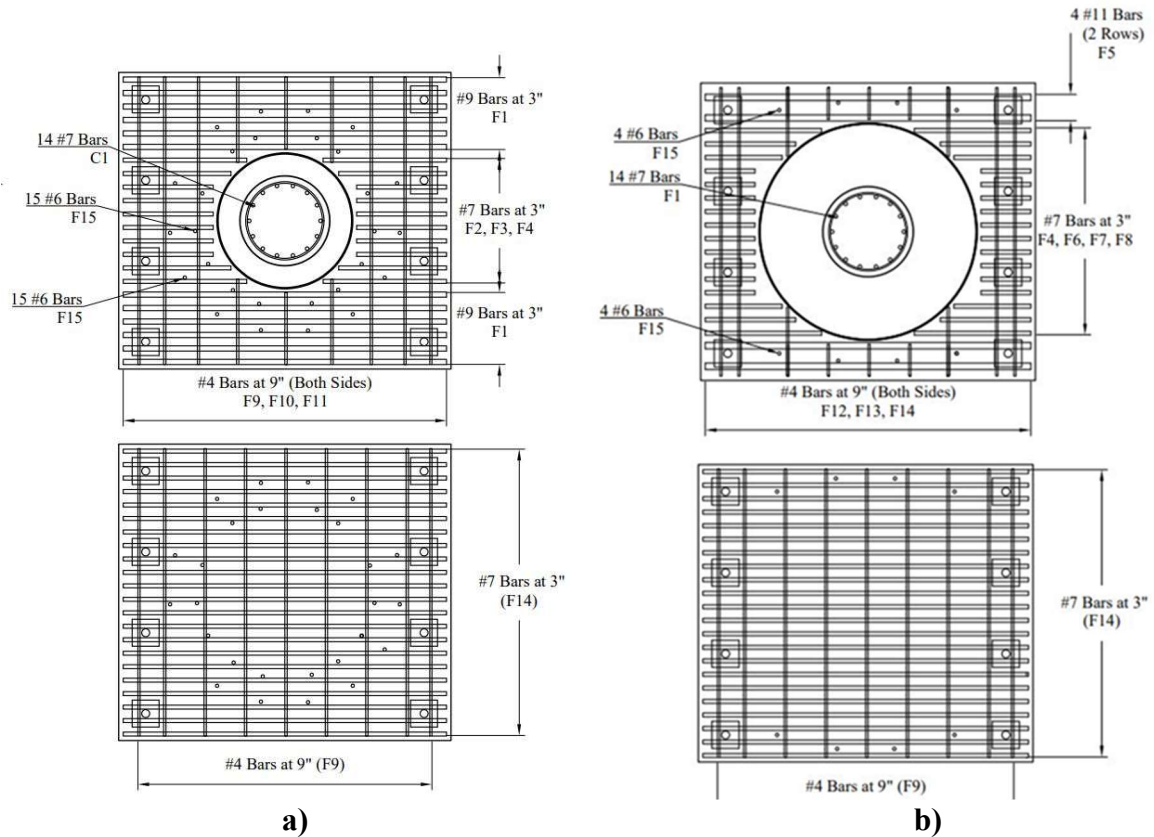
Transfer Block Reinforcement a) Specimens 30-21, 30-21-R, and 30-21-LD and b) Specimen 48-21
